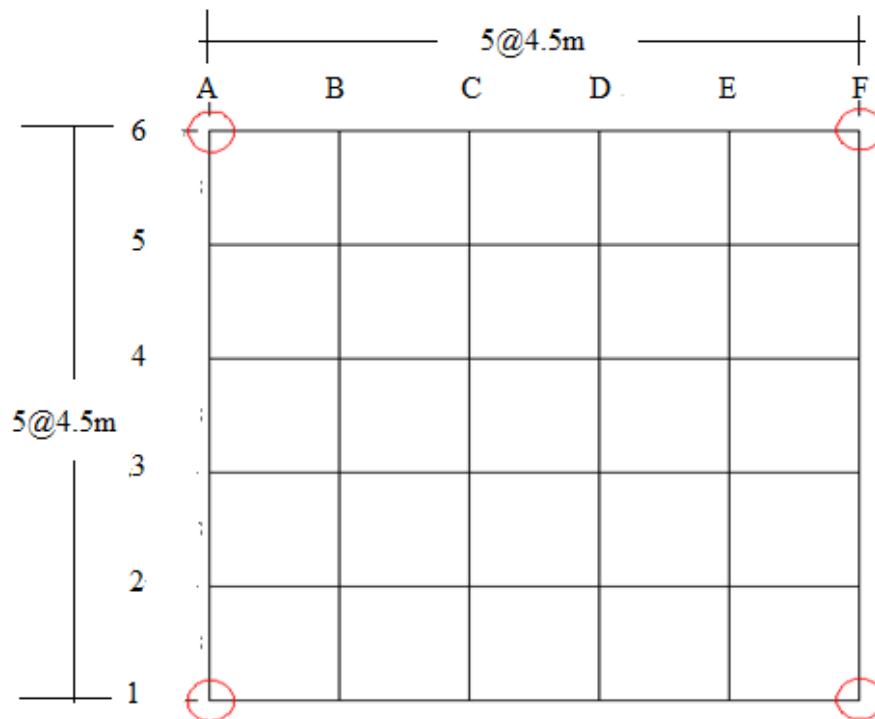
1 Plan view of building with column floated at extreme corner of ground floor
